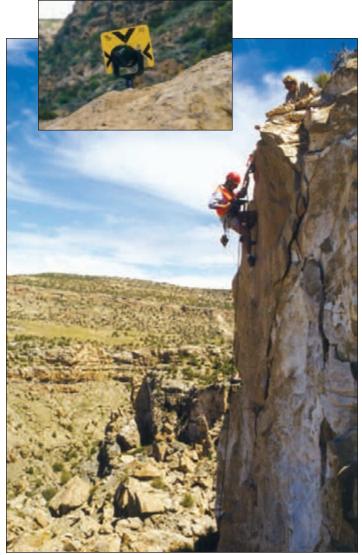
Installation of target prism anchored to a cliff to measure rock movement. Prism is screwed into a wedge anchor bolt that is installed into a drill hole. (Photos by Jon White.)
